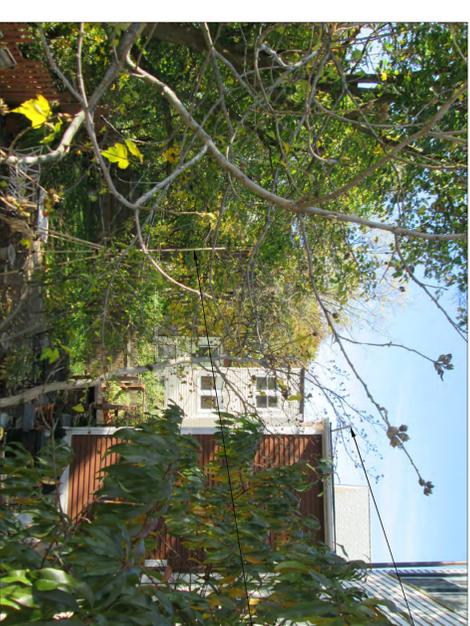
(WITHOUT ADDITION OUTLINE)
